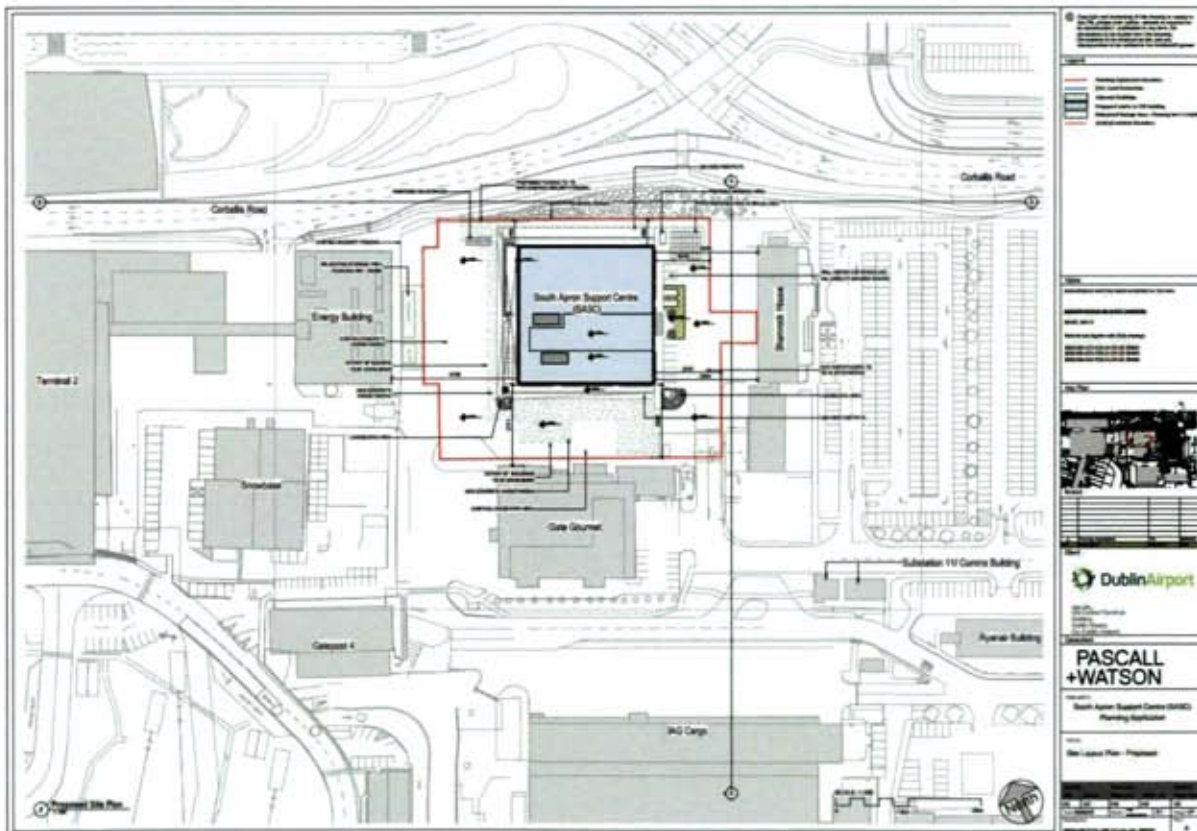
Proposed Site Layout Plan for the South Apron Support Centre
